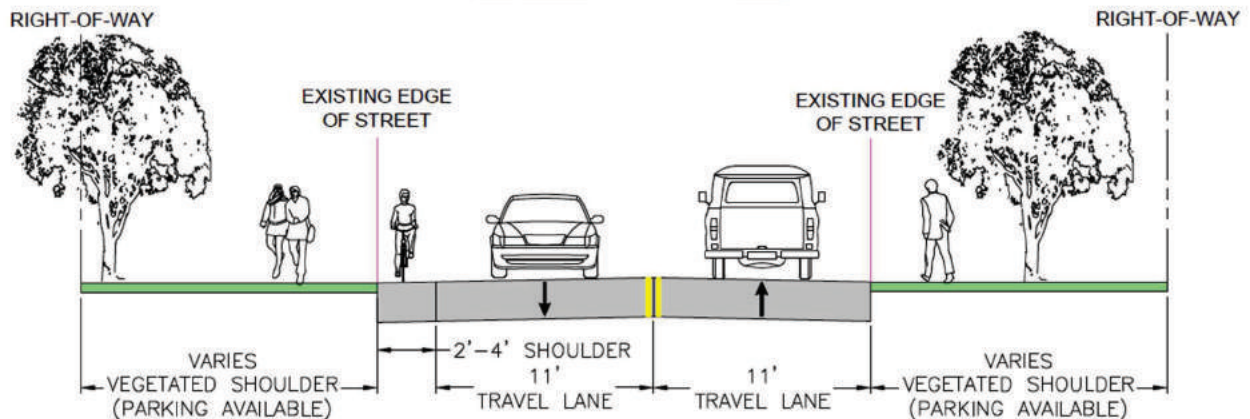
Coleman Avenue Existing Cross Section (Menlo Oaks) Looking East Toward Willow Road
